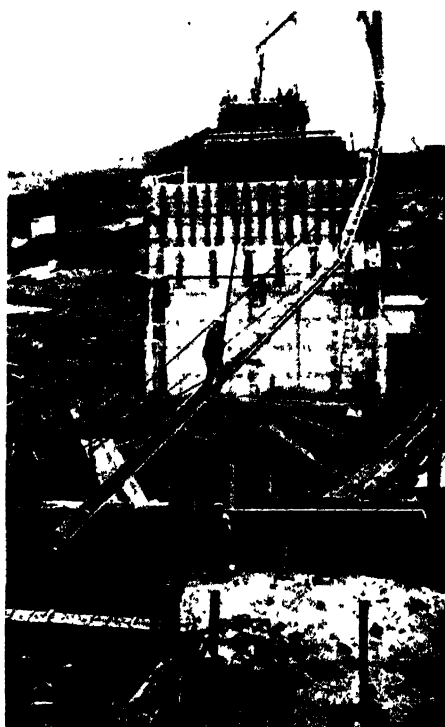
Looking North along Main Line showing Main Piers and Long Chute Line, suspended from Blondin Wire.
